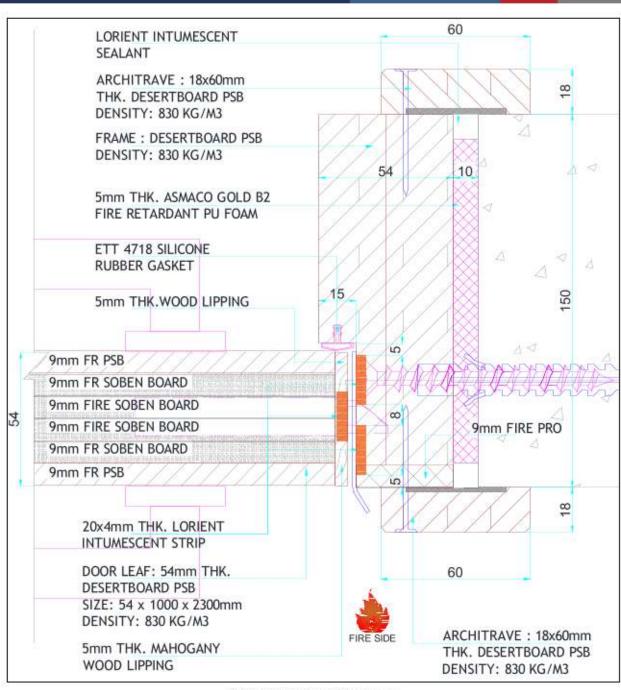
Detail F of drawing 5). (Drawing provided by the test sponsor)
